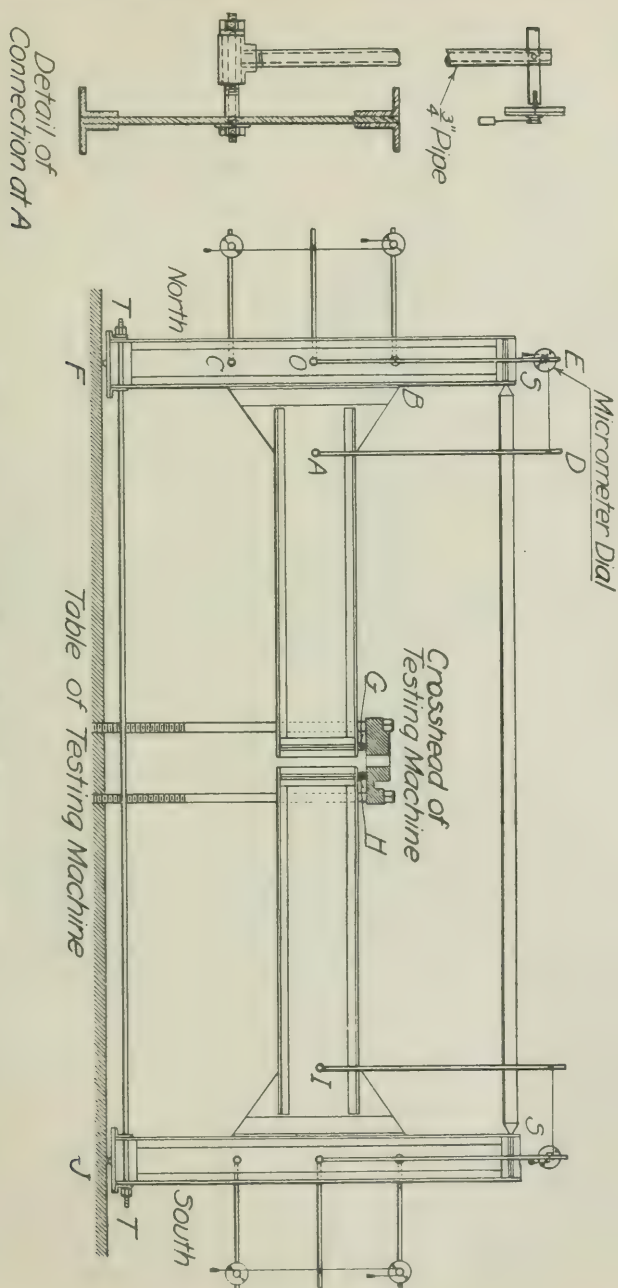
DIAGRAM OF TEST PIECES IN TESTING MACHINE
